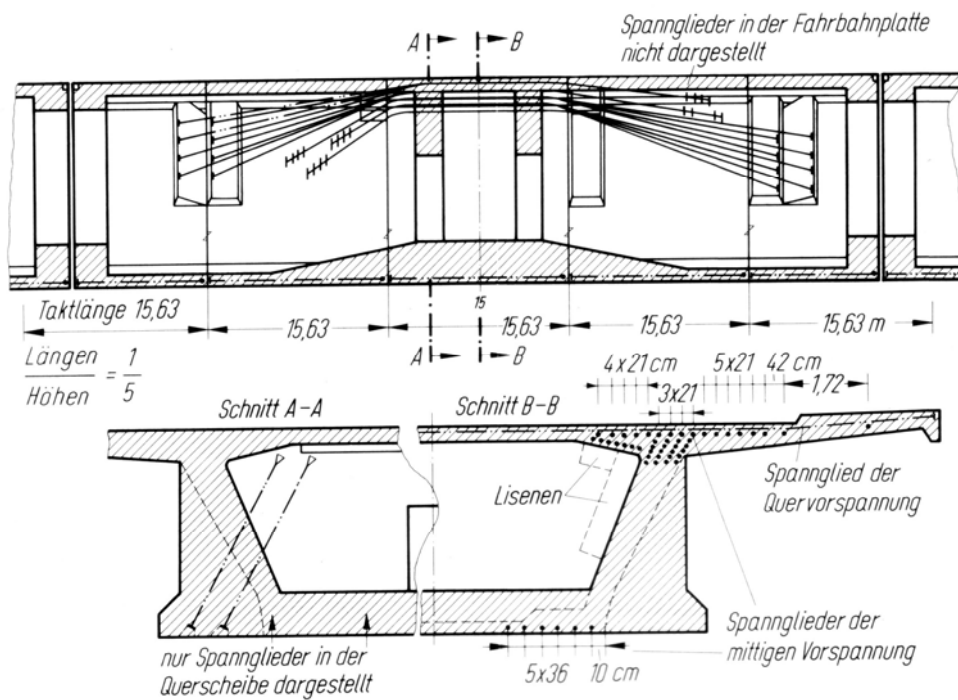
Swing bridge: a) Layout, b) Prestressing
